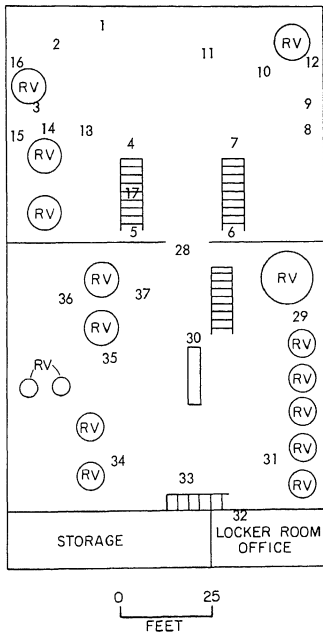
Plan View of Building 6, and Location of Survey Points Listed in Table 1.
